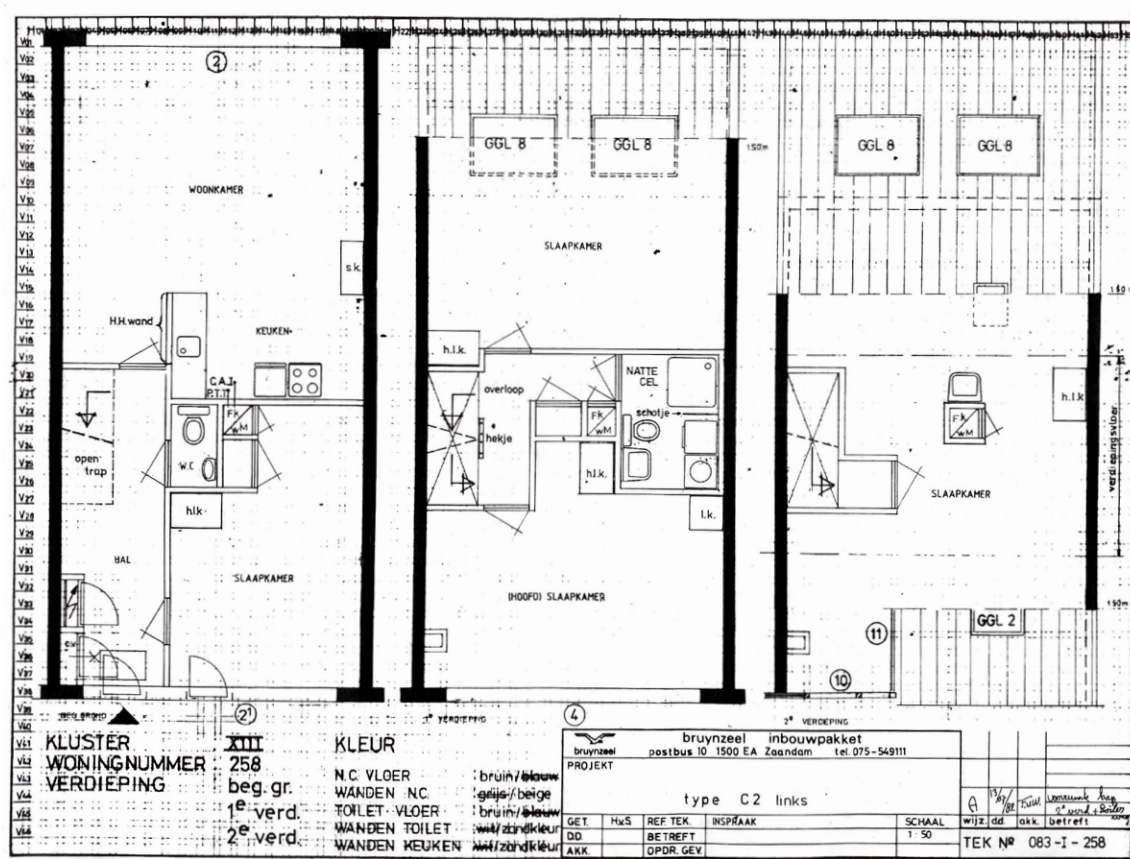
Original infill dwelling plan Household 2. Also indicating choices of colour. From: Collection Het Utrecht Archives, by Bruynzeel, 1982.
